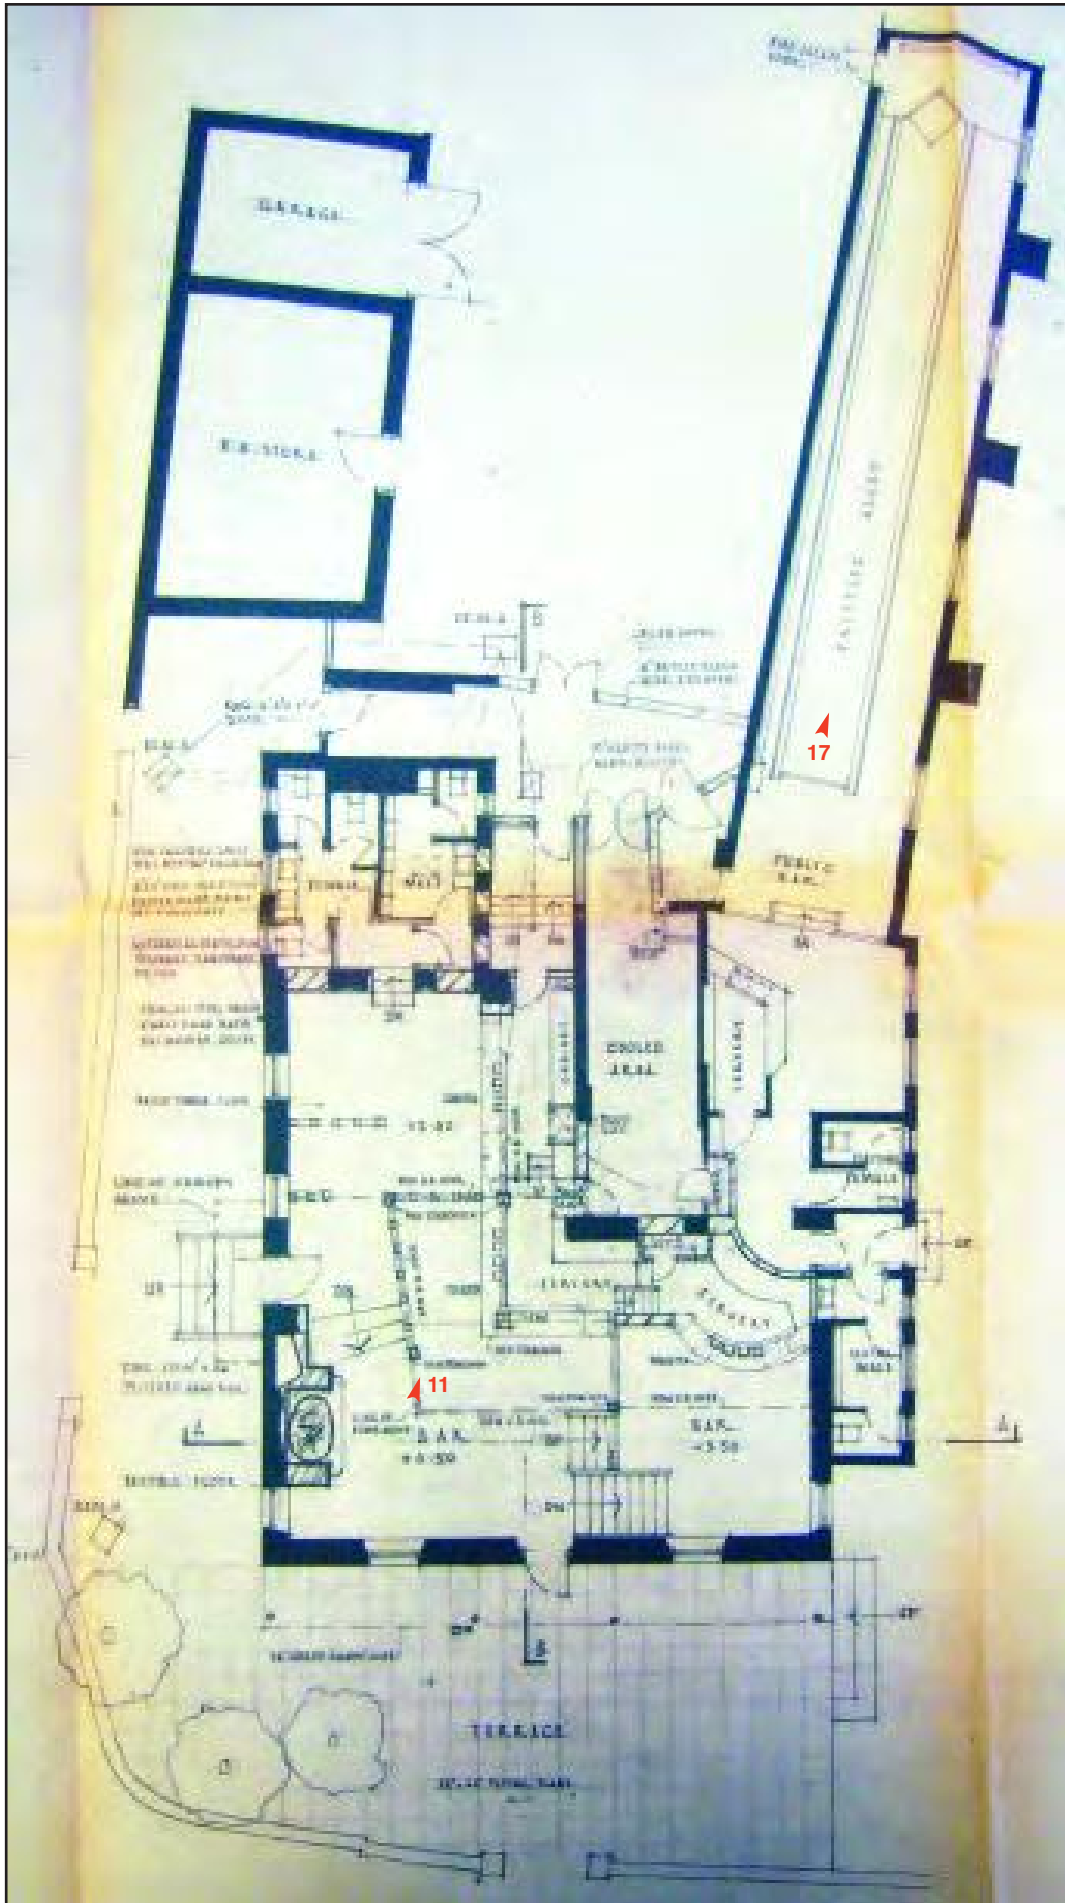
Architect's drawing dated 1973 showing ground-floor alterations (BCC) and plate directions
